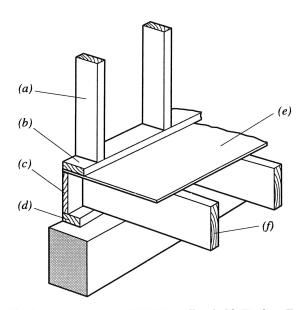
Platform construction (NBI Handbook 38 Timber Frame Houses). (a) Stud, (b) bottom rail, (c) perimeter beam, (d) sole plate, (e) subfloor, (f) floor joist.
